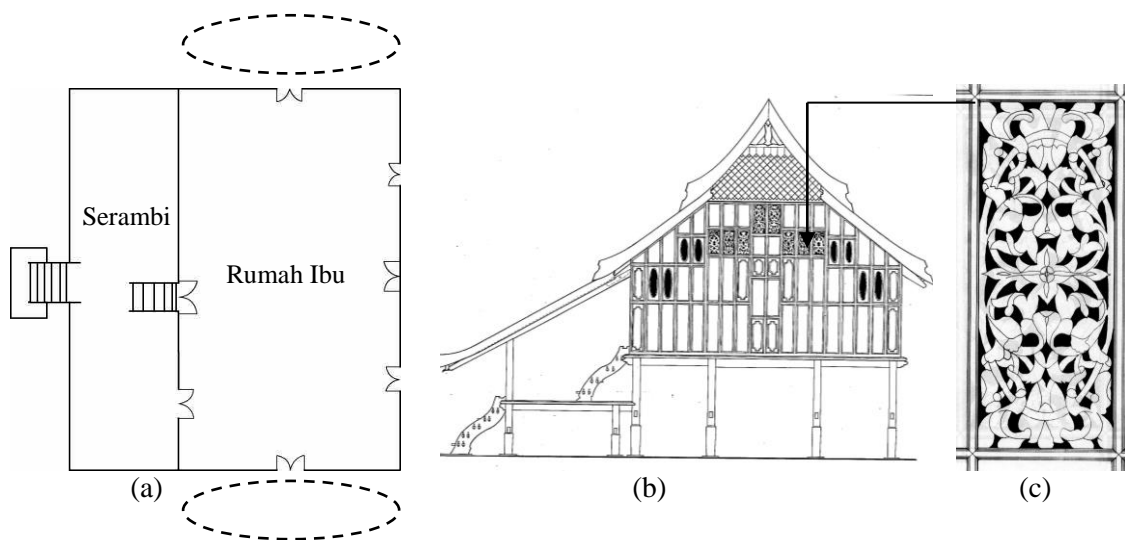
(a) The floor layout with the distributions of carvings at Tok Ku Paloh's house, (b) Layout of rectangular ventilation panels on the primary wall and (c) one of the wall ventilation panels
